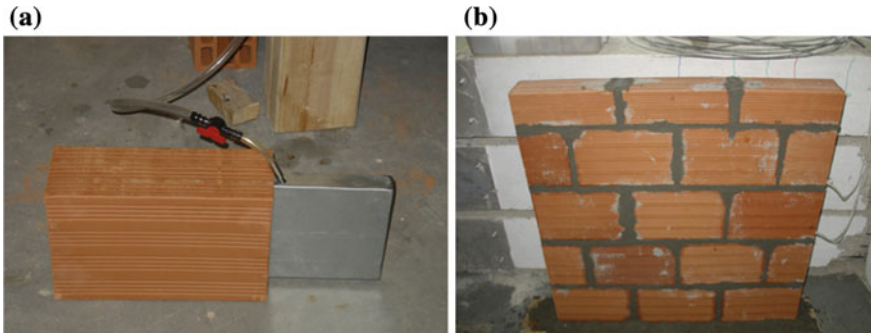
a PCM macro-capsules; b wall specimen [22]
